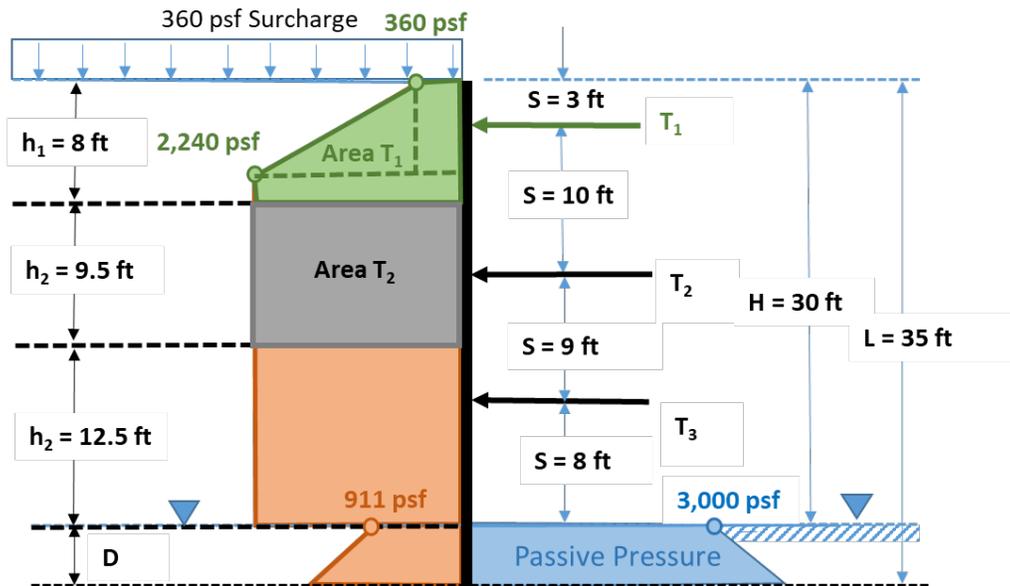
Case 8 Calculation area for Strut #1 load.
